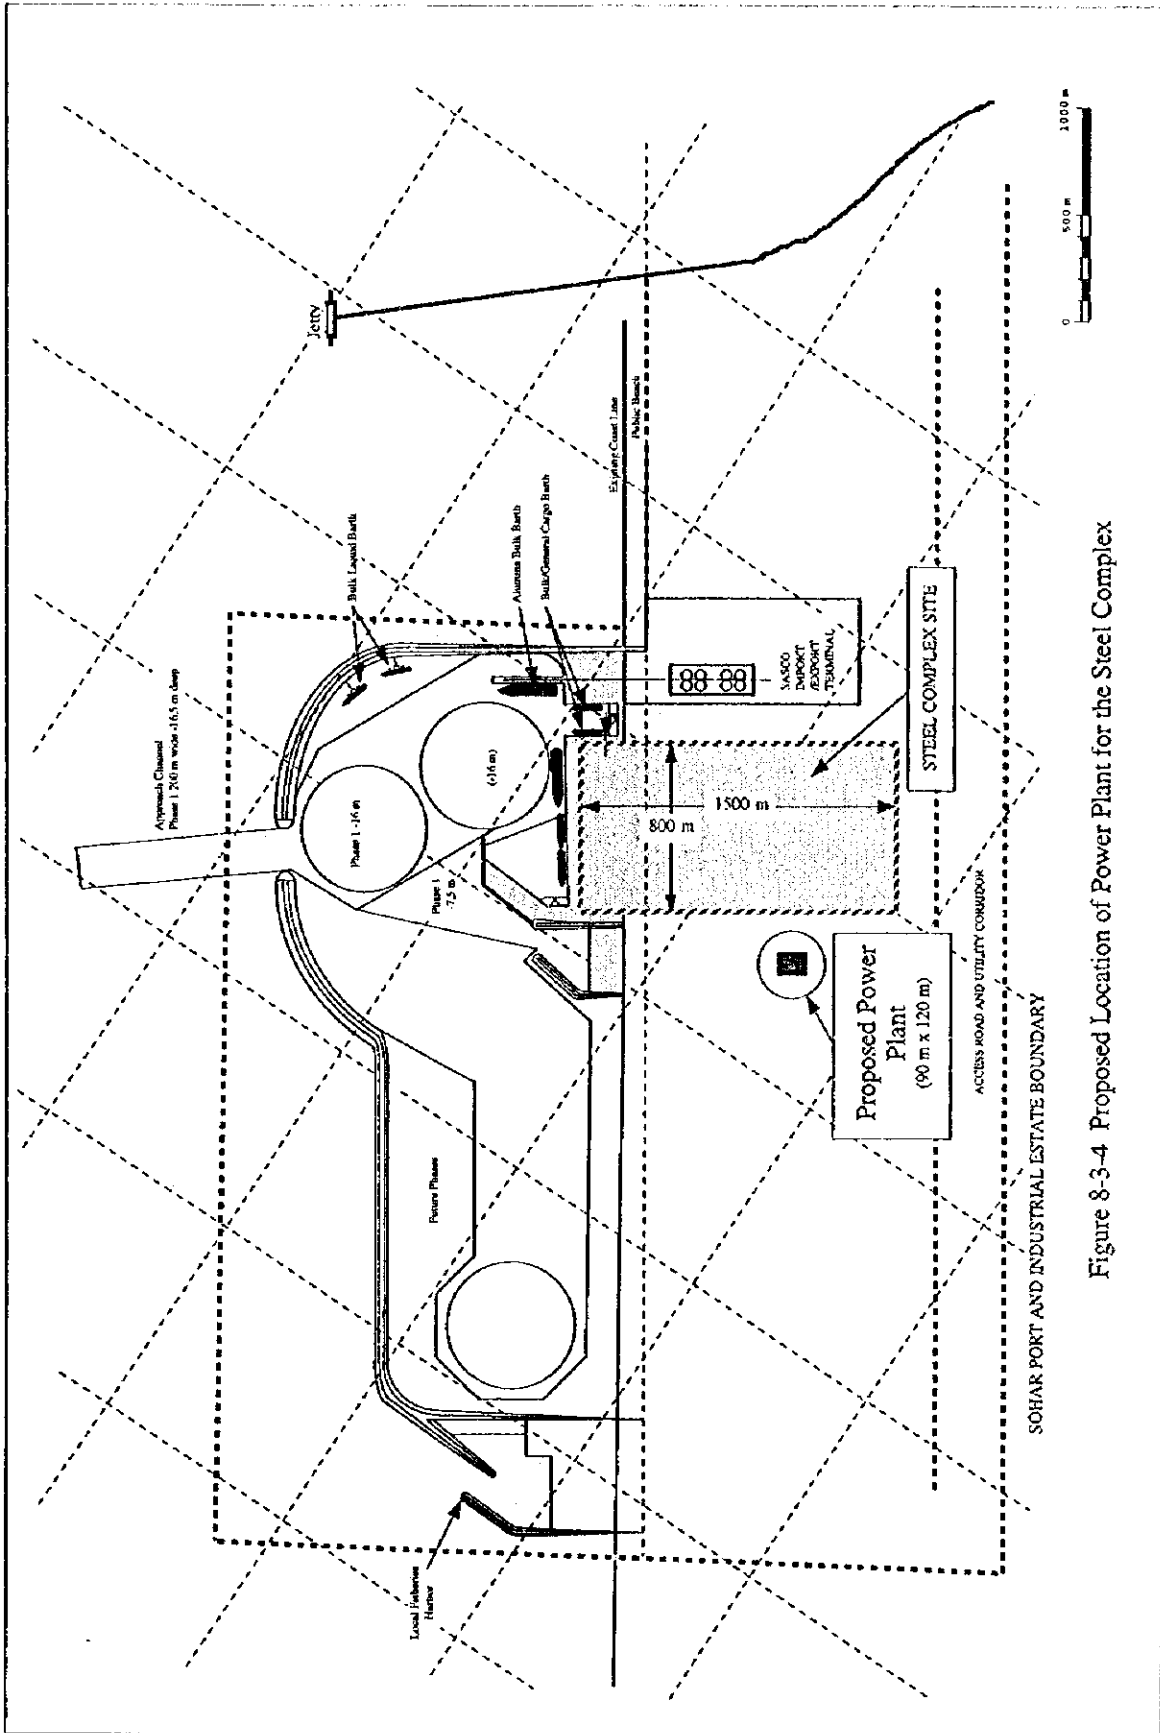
Proposed Location of Power Plant for the Steel Complex
